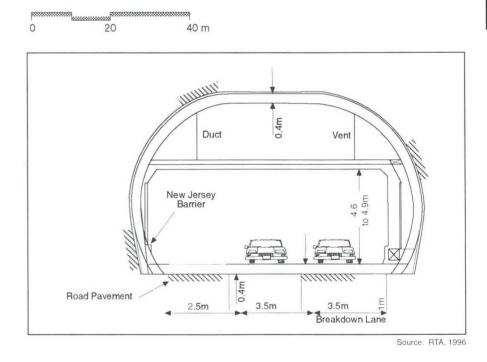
PREFERRED TUNNEL CROSS SECTION
